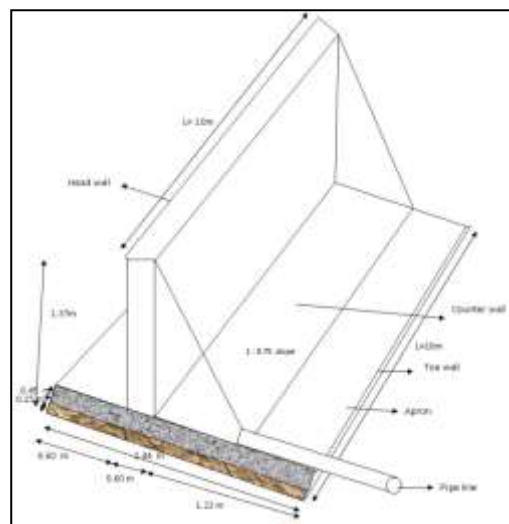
Example of Retaining wall from Udala block of Mayurbhanj district
